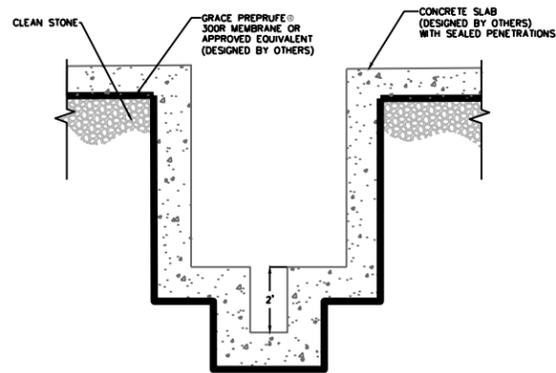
TYPICAL VAPOR BARRIER ASSEMBLY AT PENETRATION
